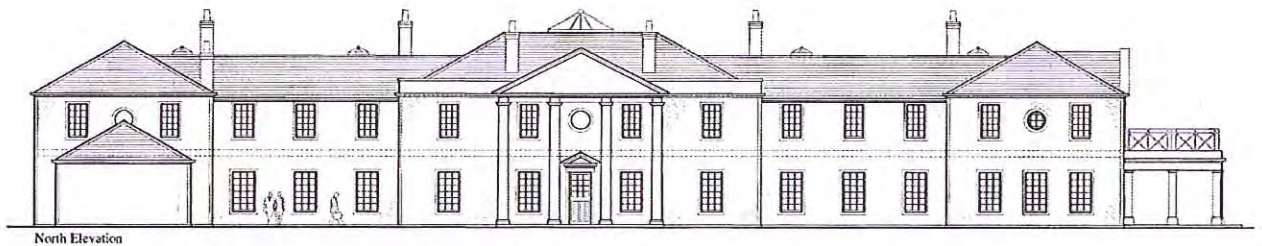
Proposed northern (rear) elevation, incorporating the main entrance
